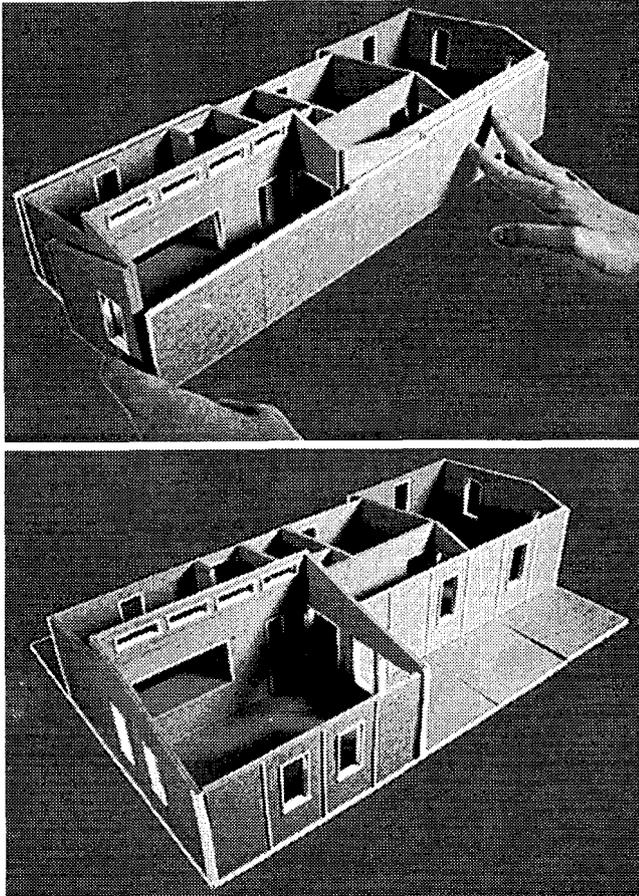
Fold-out Expansion of Manufactured House Prototype (Rob Buckanavage)
